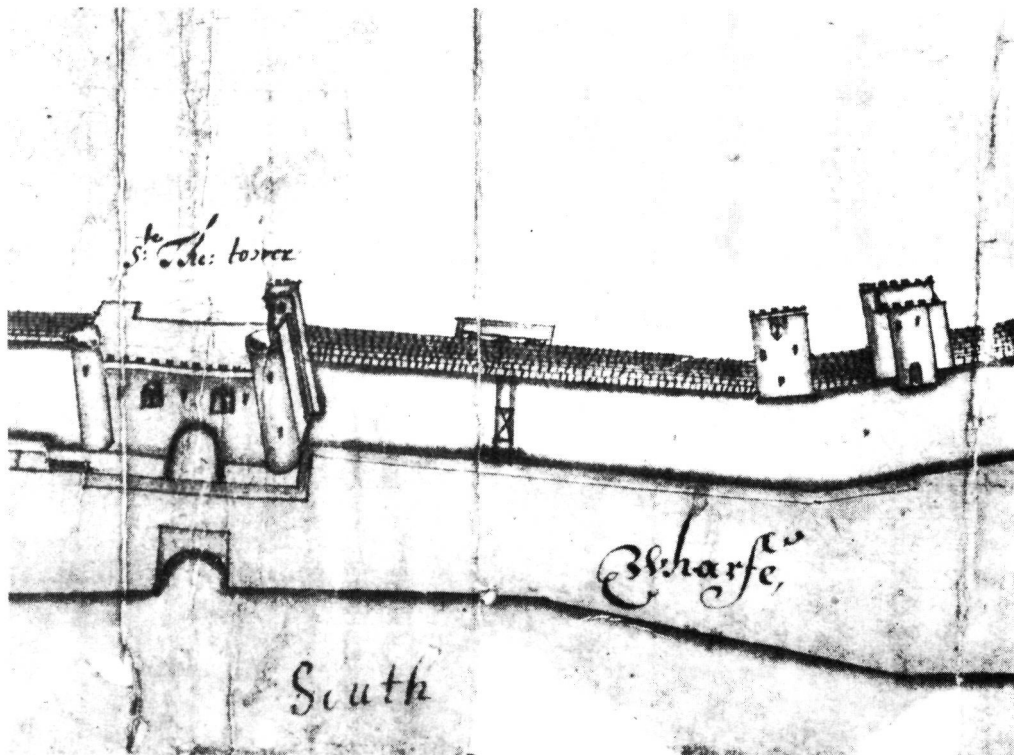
Tower of London: part of an outline plan of the Tower, dated 1666 or a little earlier, showing later bridge site east of St. Thomas's Tower.
